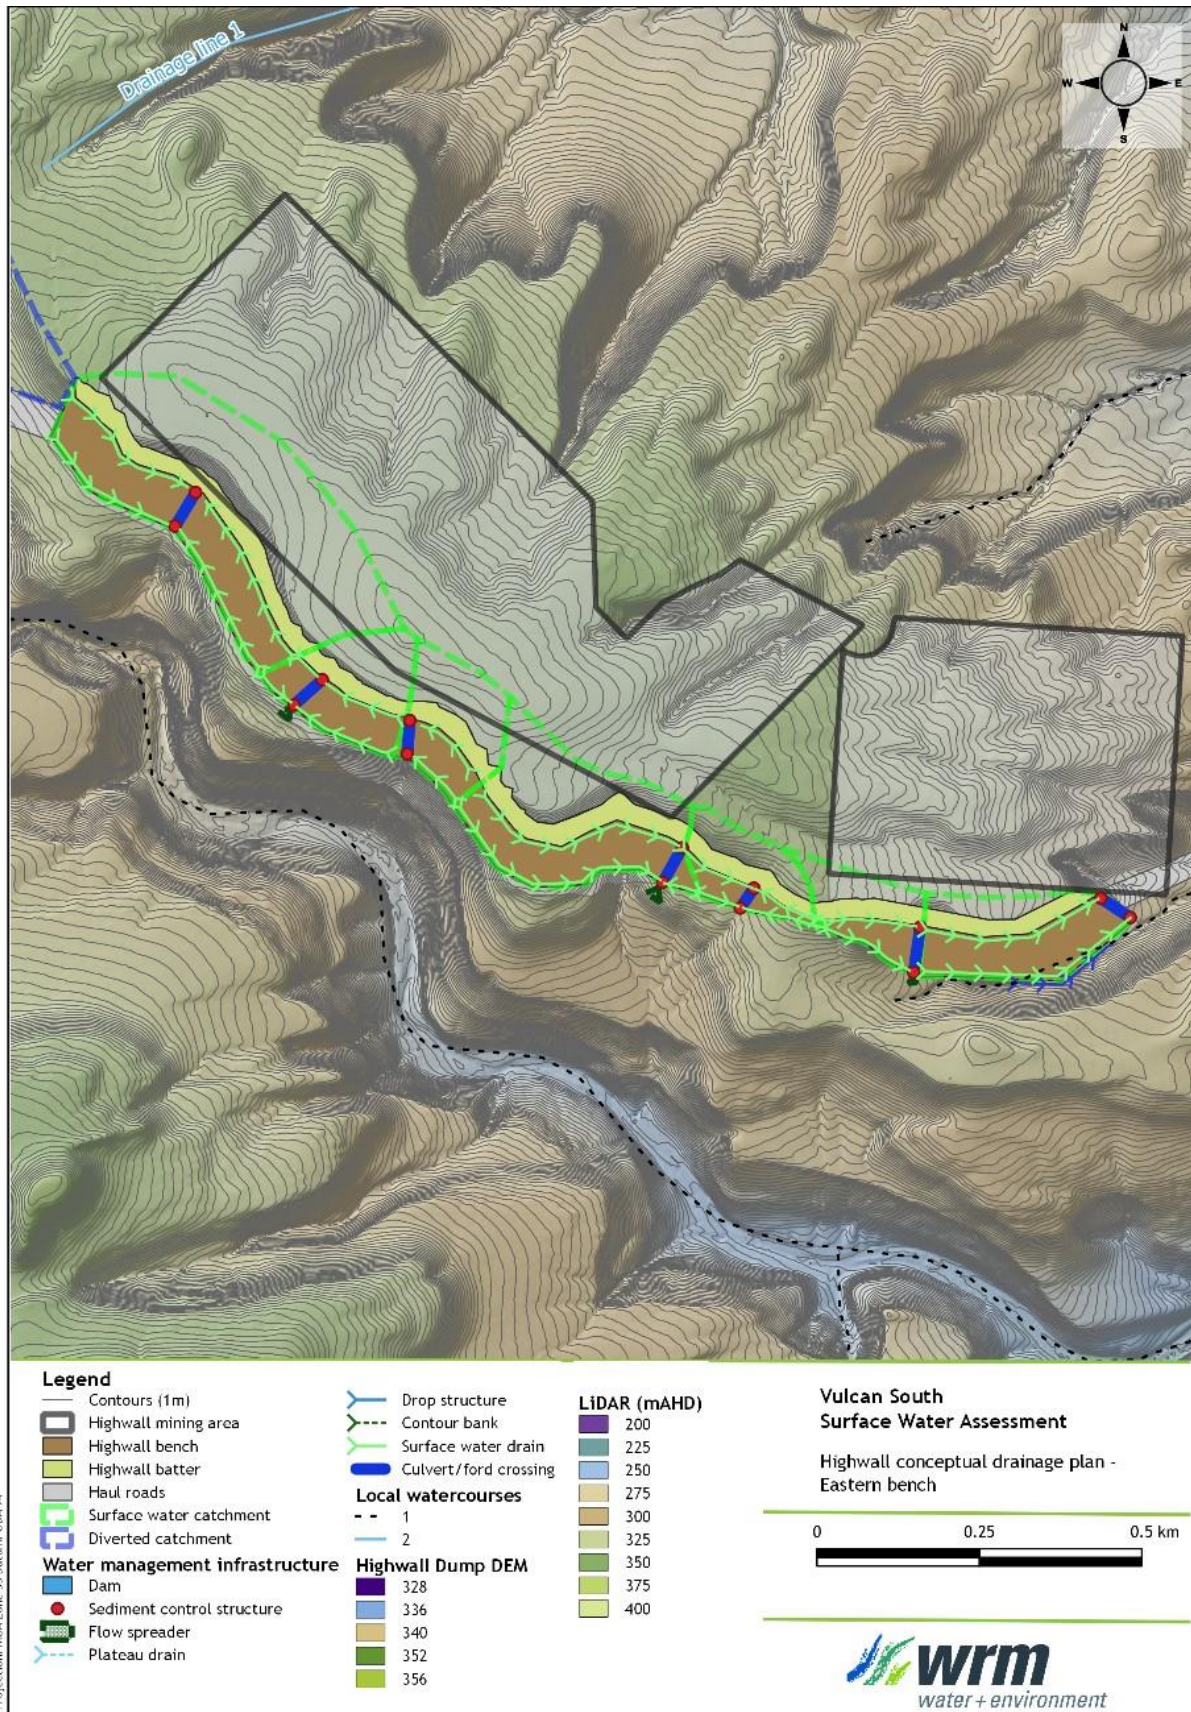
Highwall eastern bench mining area conceptual drainage plan
